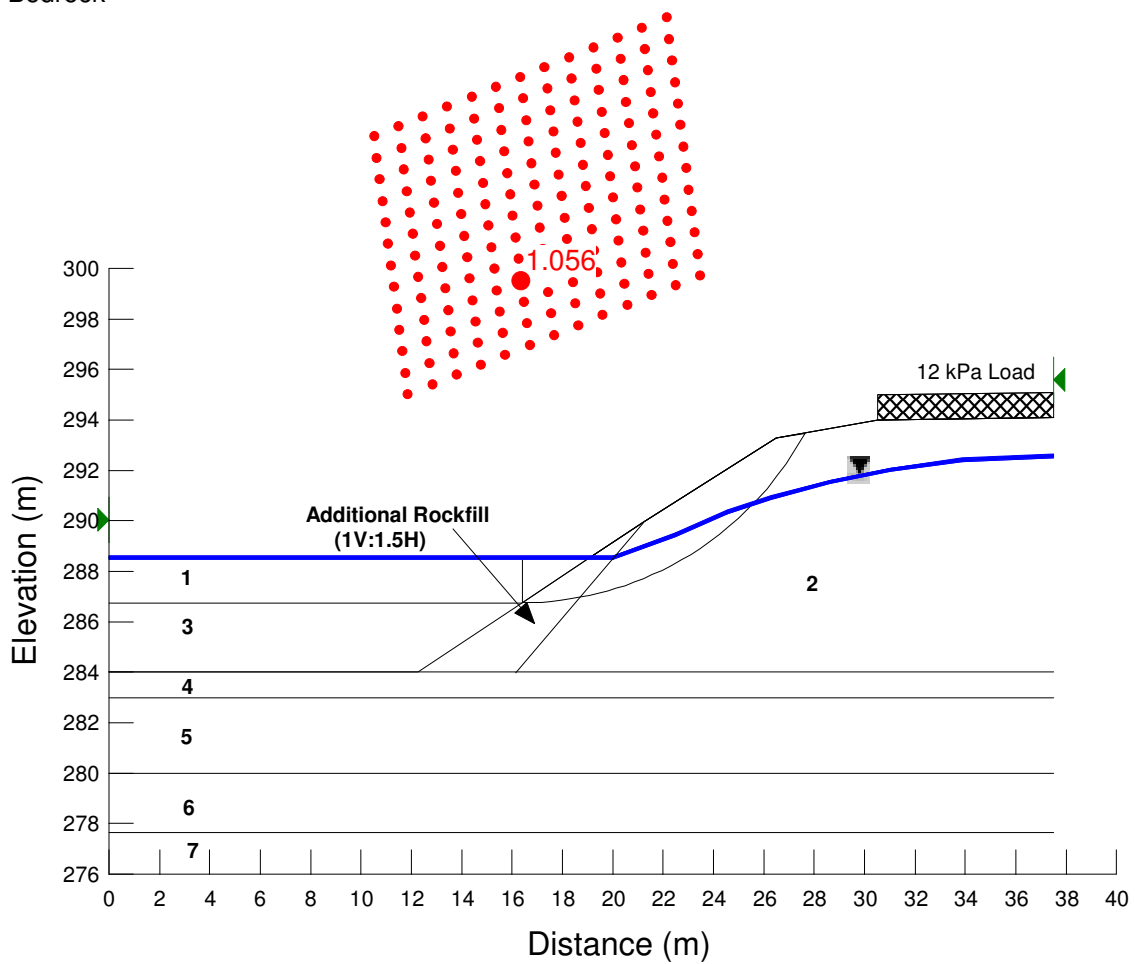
Stability of HWY11 Road Section at Sta. 14+800
